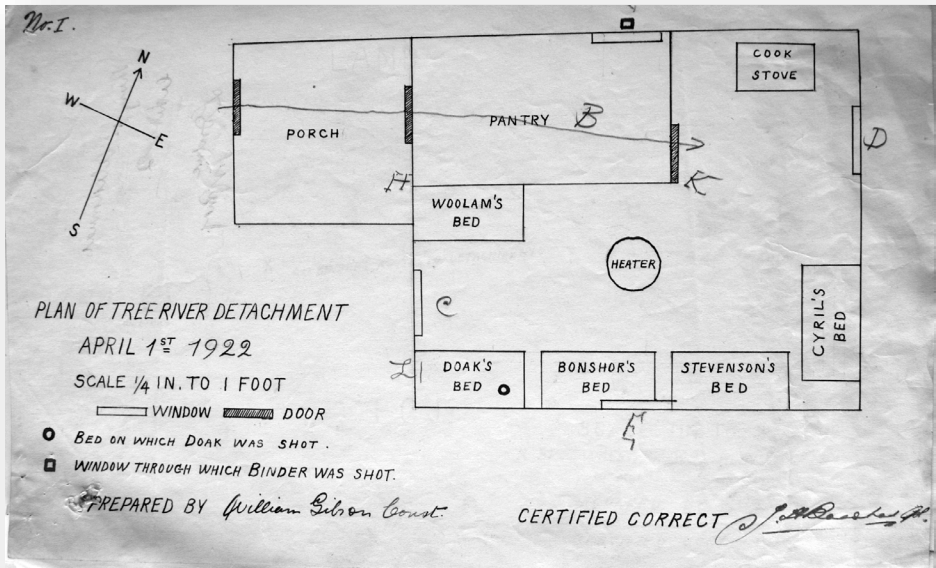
Exhibit 11 - Plan of Tree River Detachment house.
